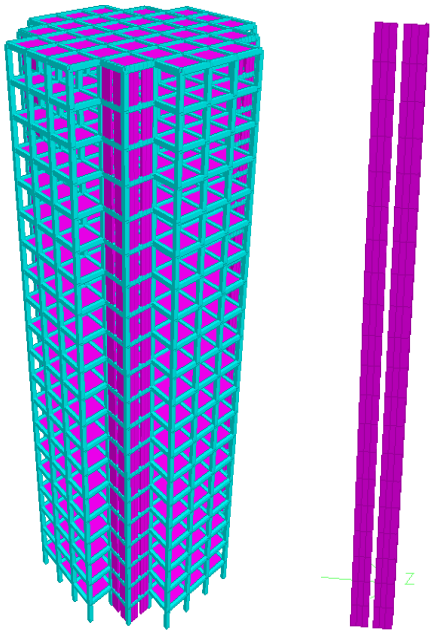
Case WO3: - (Bay size = 5 m x 4 m & shear wall opening area = 0.71 m x 4 m (14.2%))
